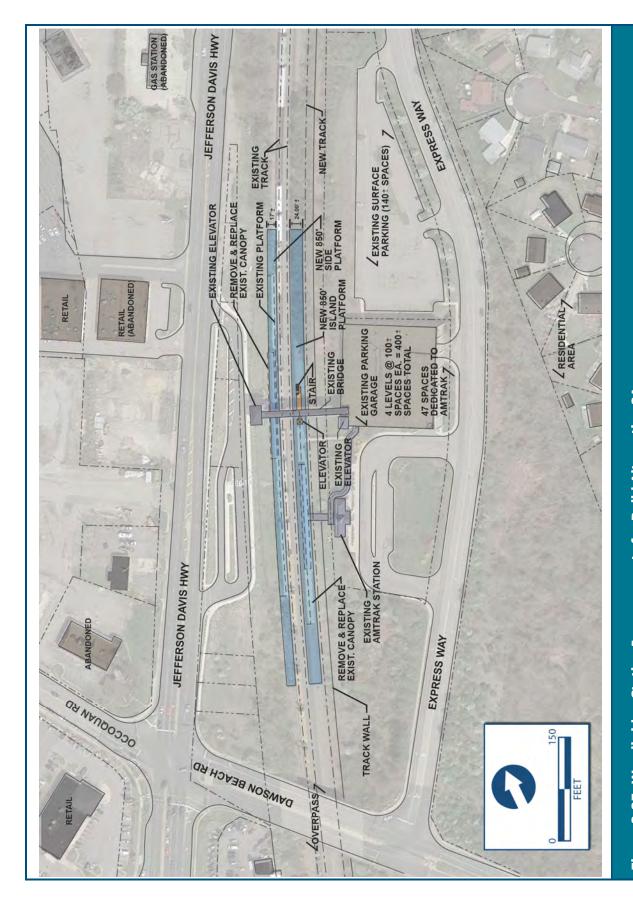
Woodbridge Station Improvements for Build Alternative 2A
